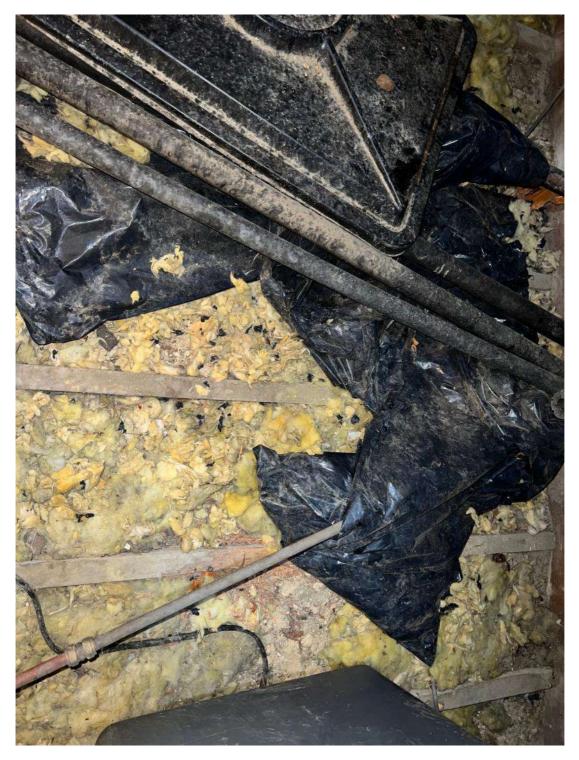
Building 2 (ref B2A). Likely evidence of squirrel damage. A squirrel has been seen to enter the roof space of building 3 on multiple occasions during the survey visits.
